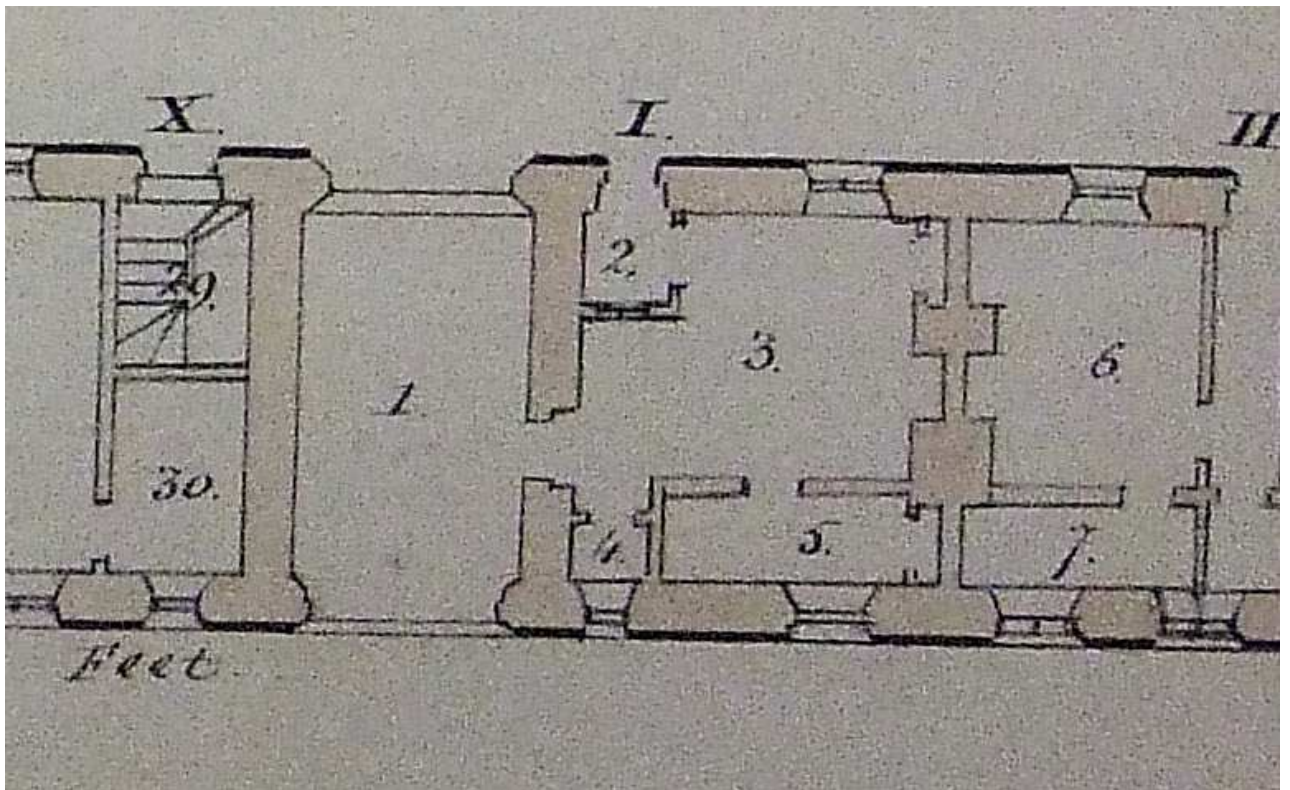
Extract showing plan of Porters' Lodge from Plan of Corpus Christi College (1848)
